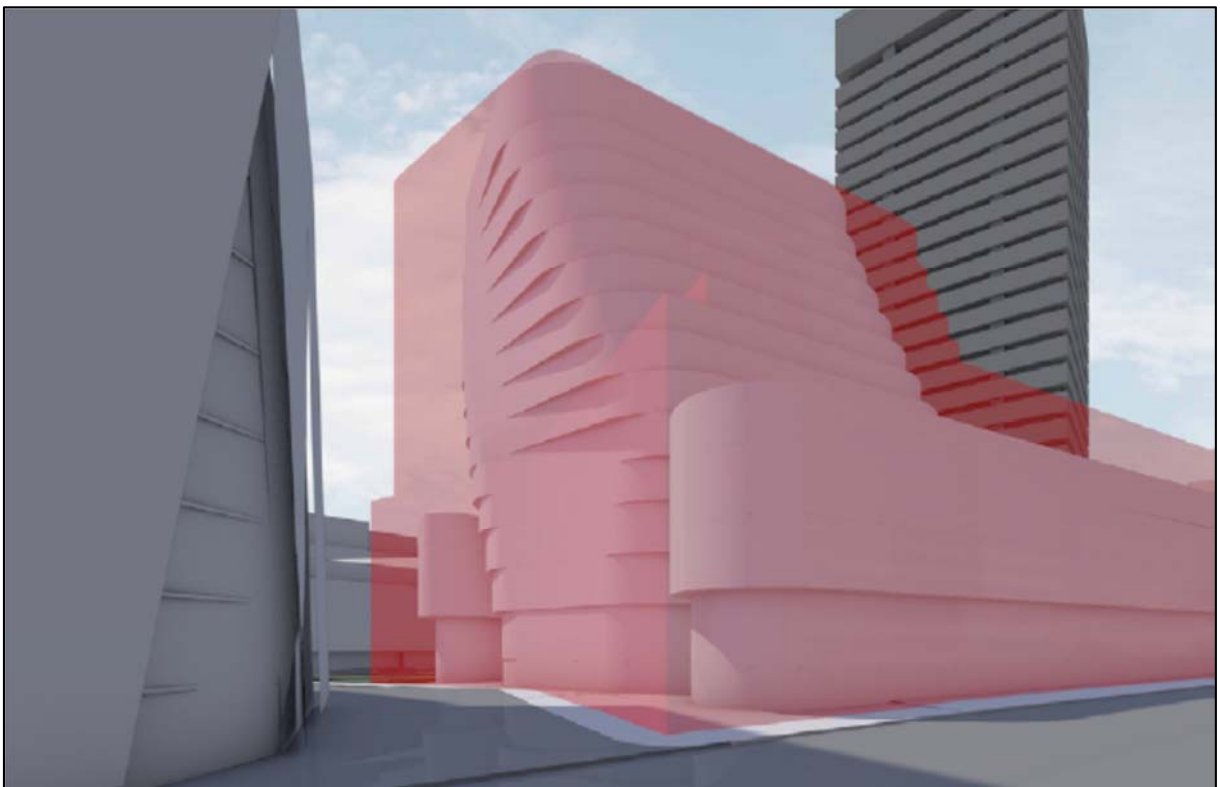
View from Broadway of proposed building mass (pink) within approved envelope (red)
